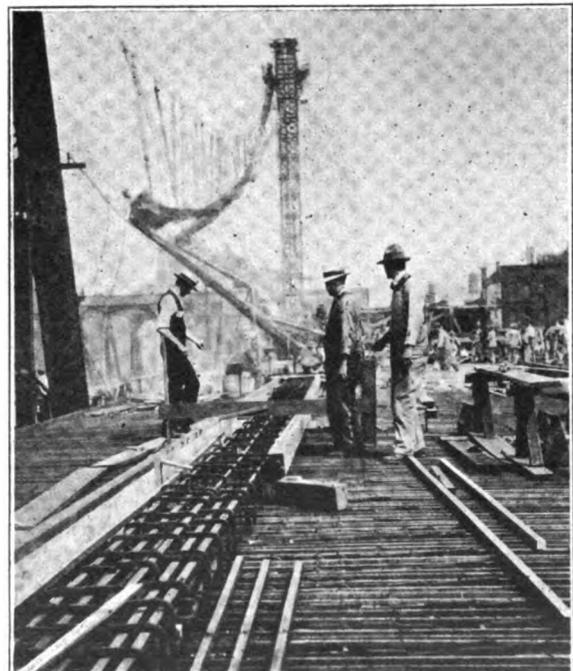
Showing to Excellent Purpose the Amount and Kind of Reinforcement Used.
